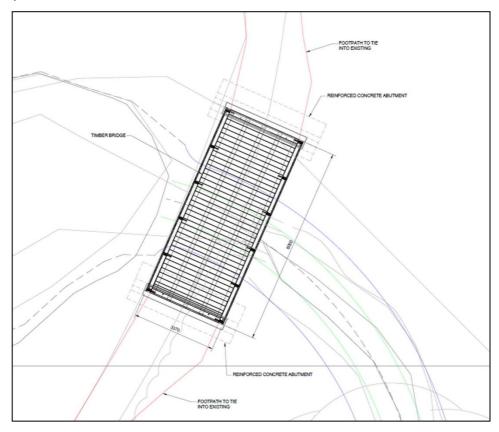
Plan view of the northern bridge (extract from drawing A119099-TGEE-ZZ-XX-DR-C-0011)
